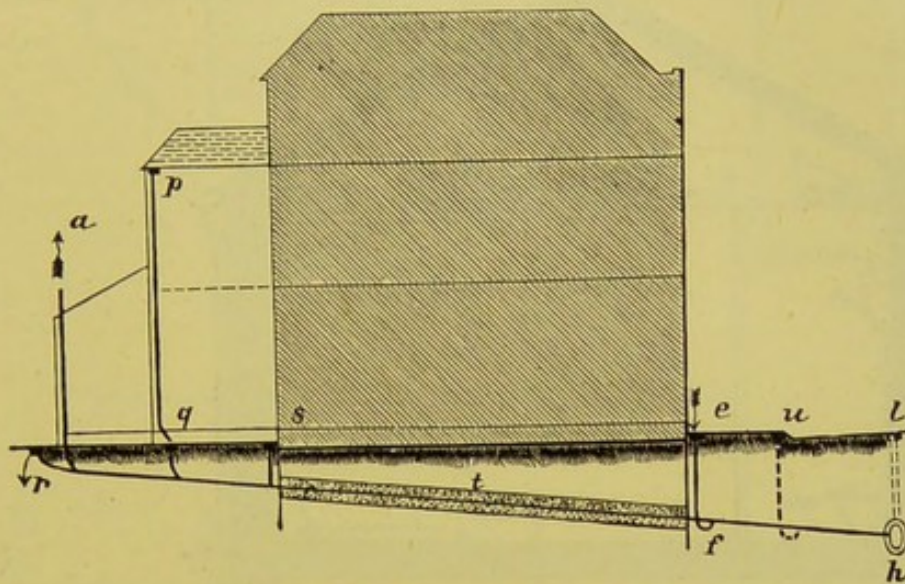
SCHEME OF THE DRAINAGE OF THE SAME HOUSE (SECTION).
